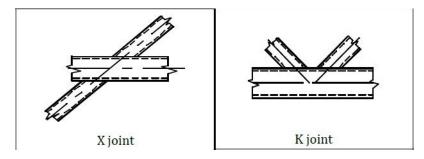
Typical configurations of tubular joints and braced members in jacketed structures [Technical Committee CEN/TC250, 2018].
